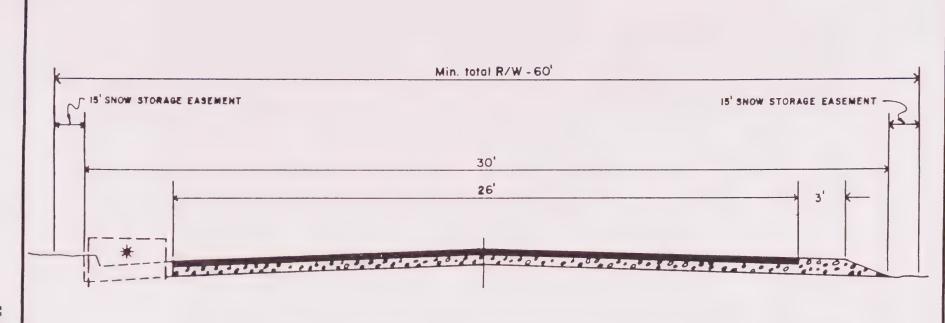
JUNE LAKE TYPICAL SECTION COLLECTOR/RESIDENTIAL
